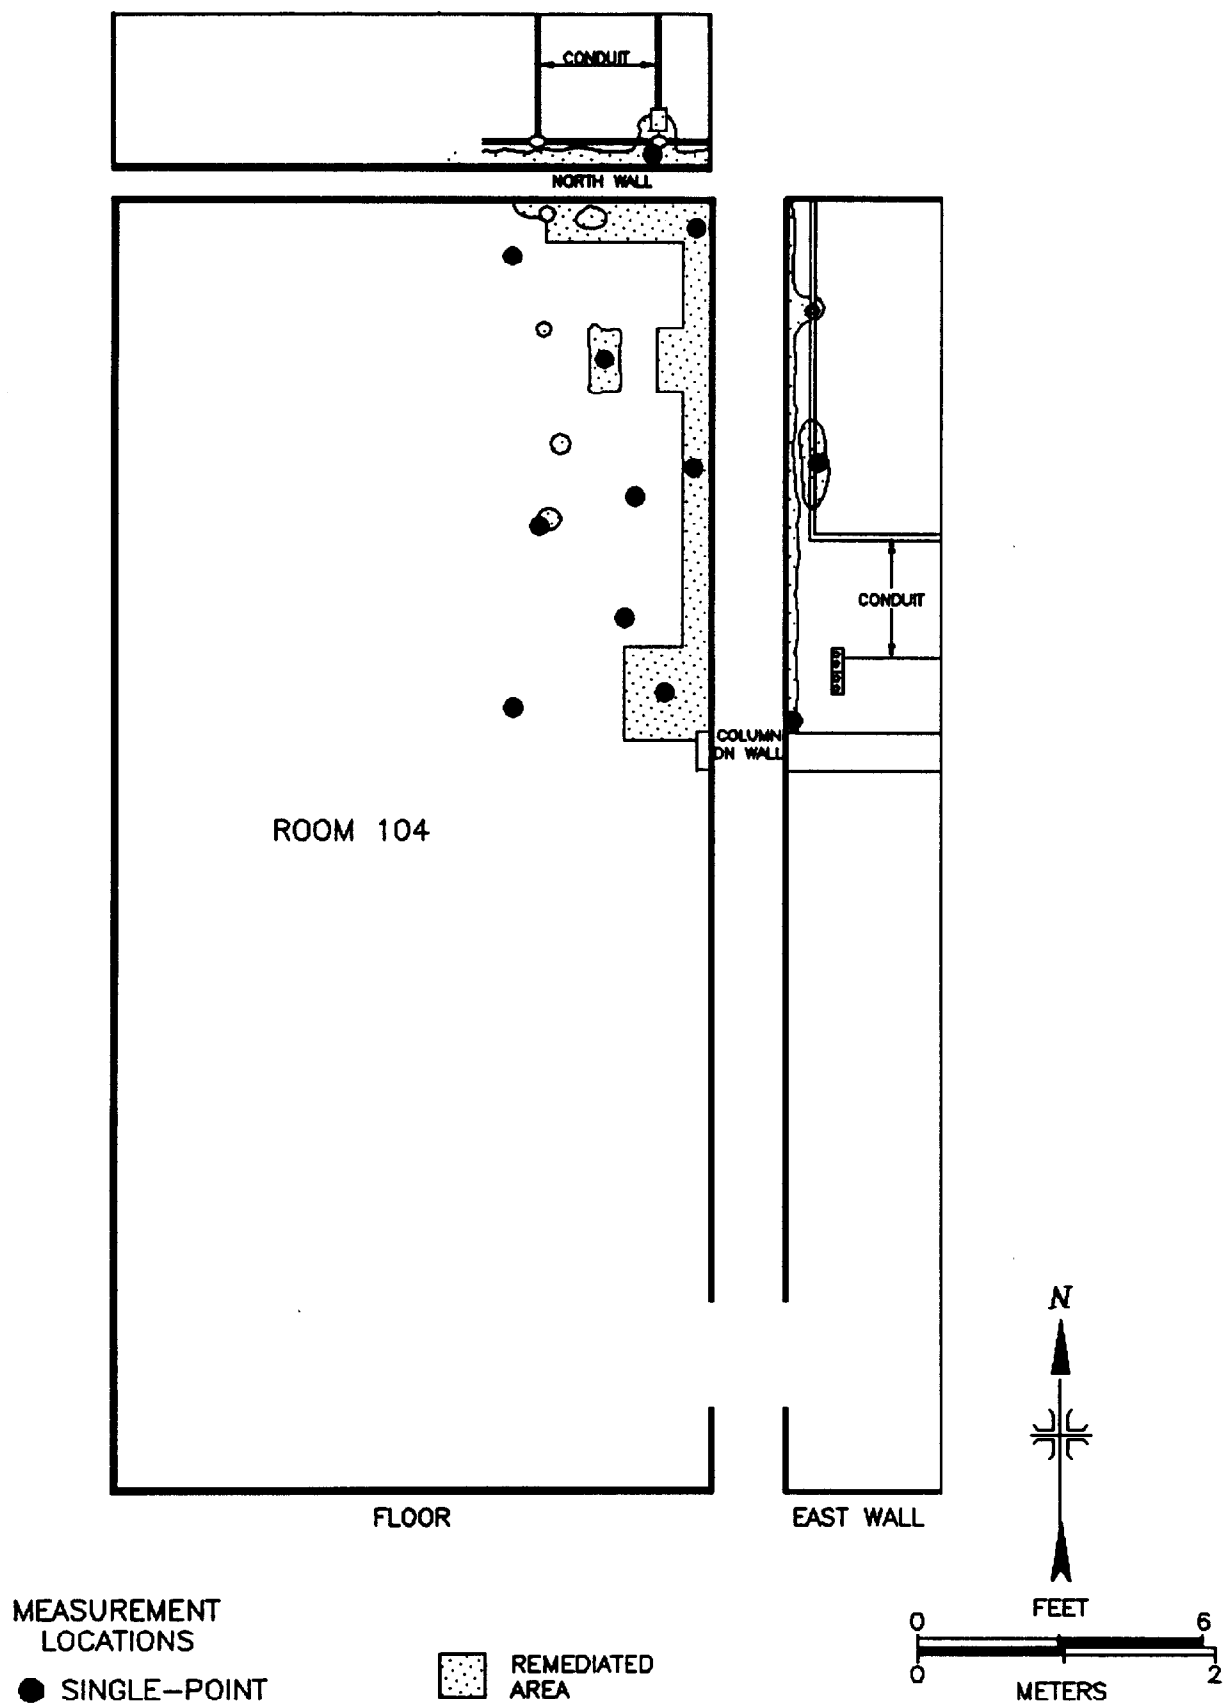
Building 33, Room 104 Floor and Wall — Remediated Area and Measurement Locations
